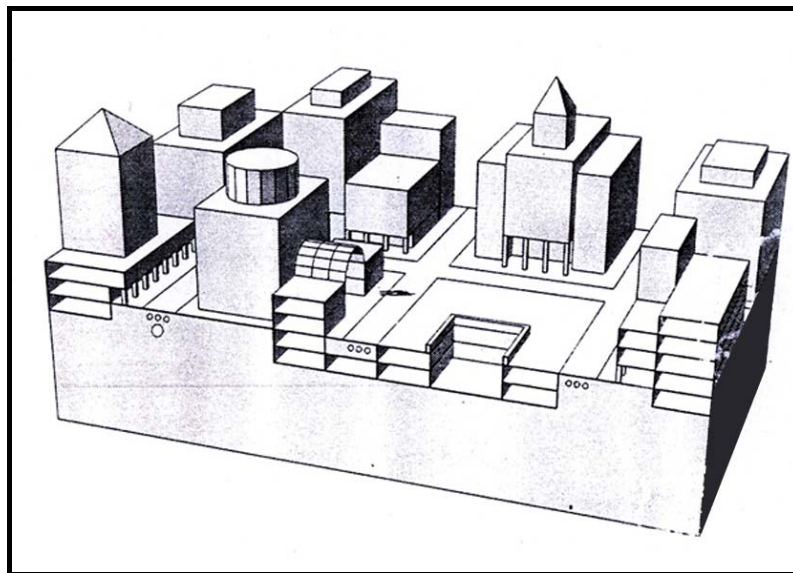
Use of Shallow Underground Space (Source: Sterling, 1993).
